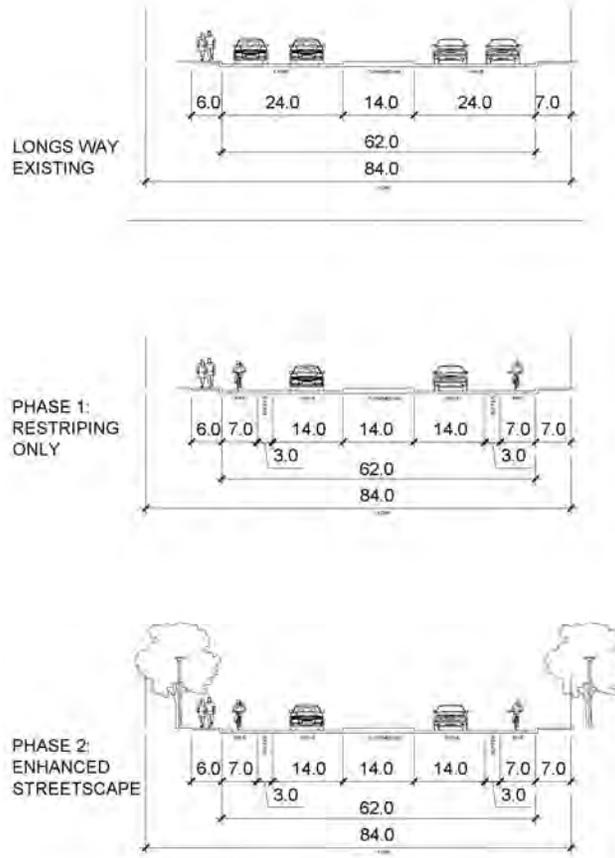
Cross Sections: Longs Way Dransfeldt to Parker Road
